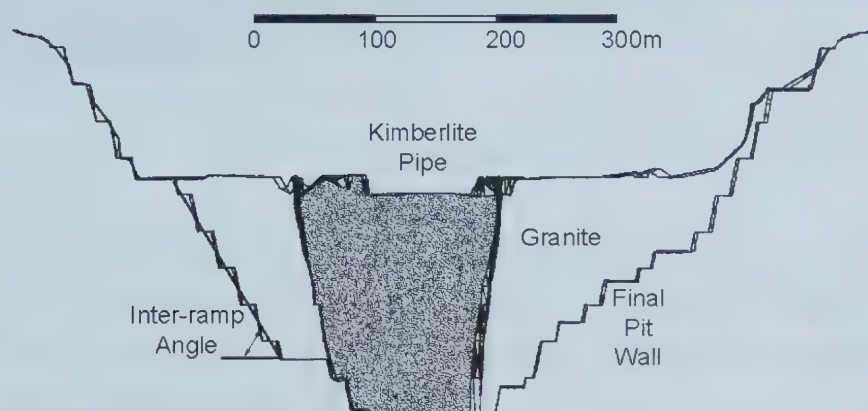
Open Pit Mining of a Kimberlite Pipe (modified from Peterson and Tannant, 2001)
